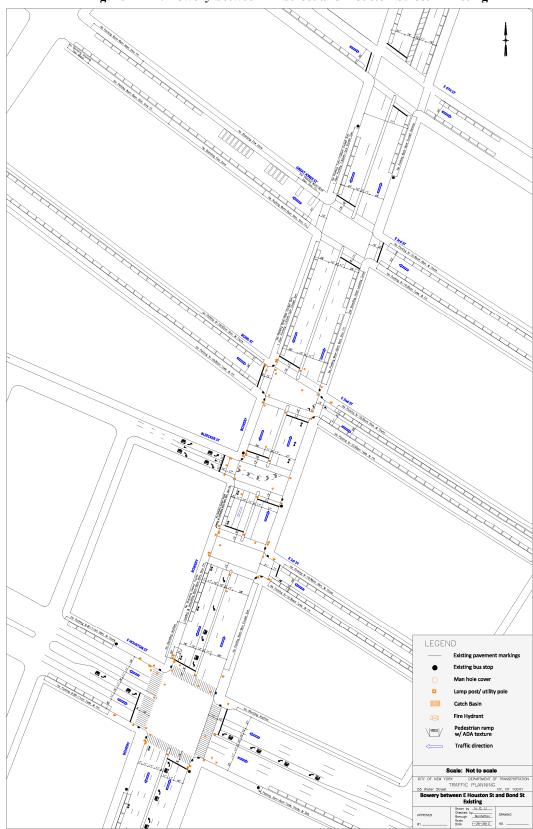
Bowery between 4th Street and Houston Street - Existing
